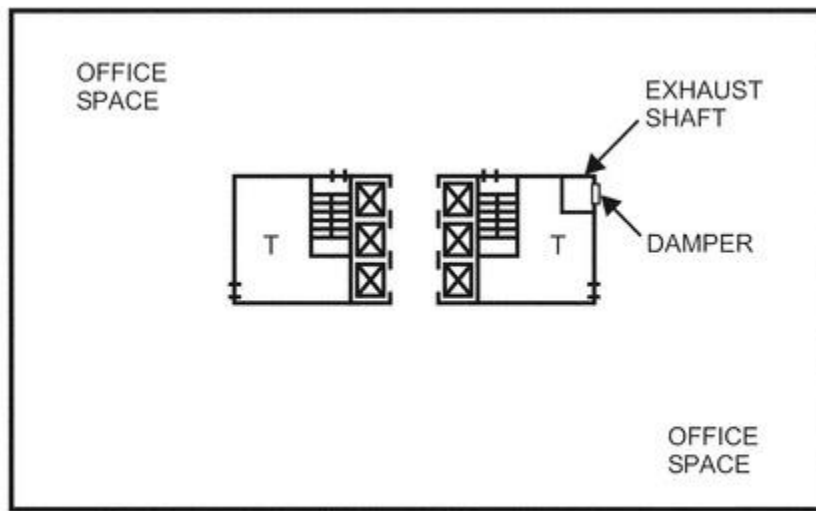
Typical Floor Plan of Example Building with Exterior Vent (EV) System
